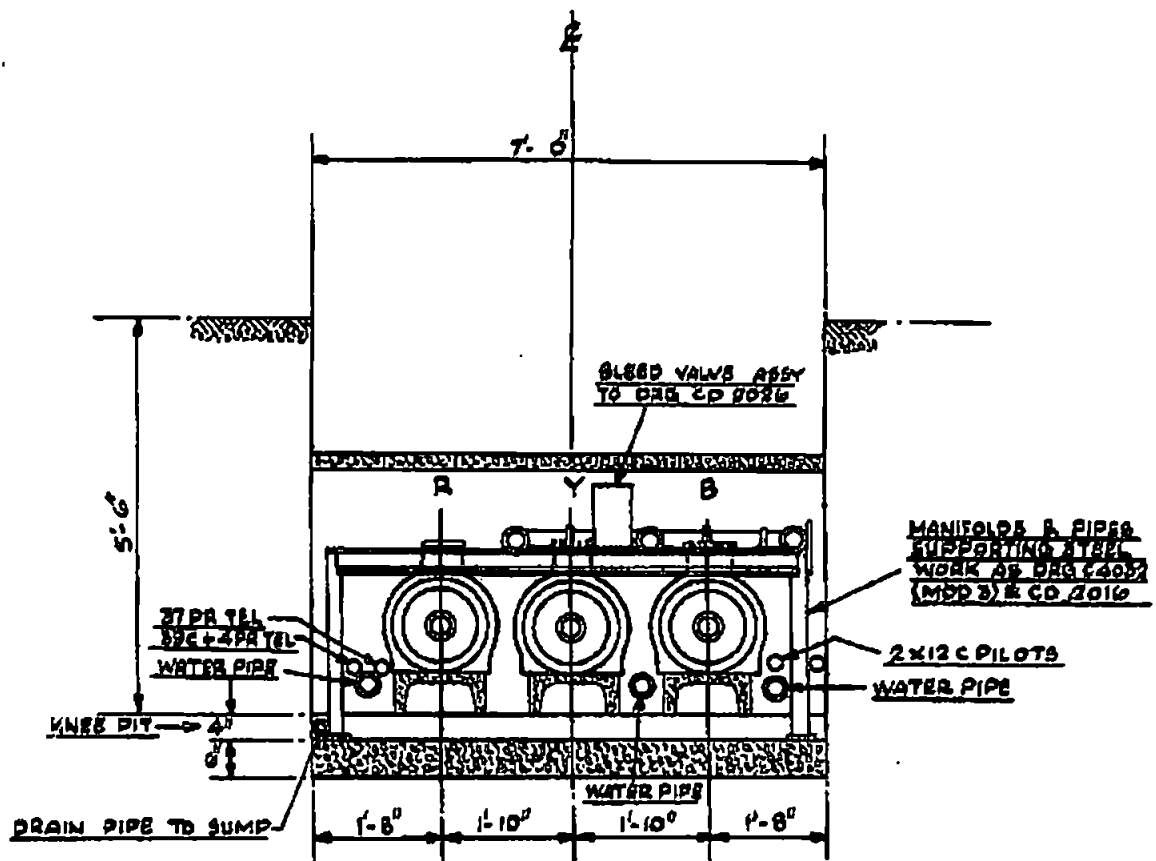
Joint bay cross-section for a self-contained oil-filled cable.
